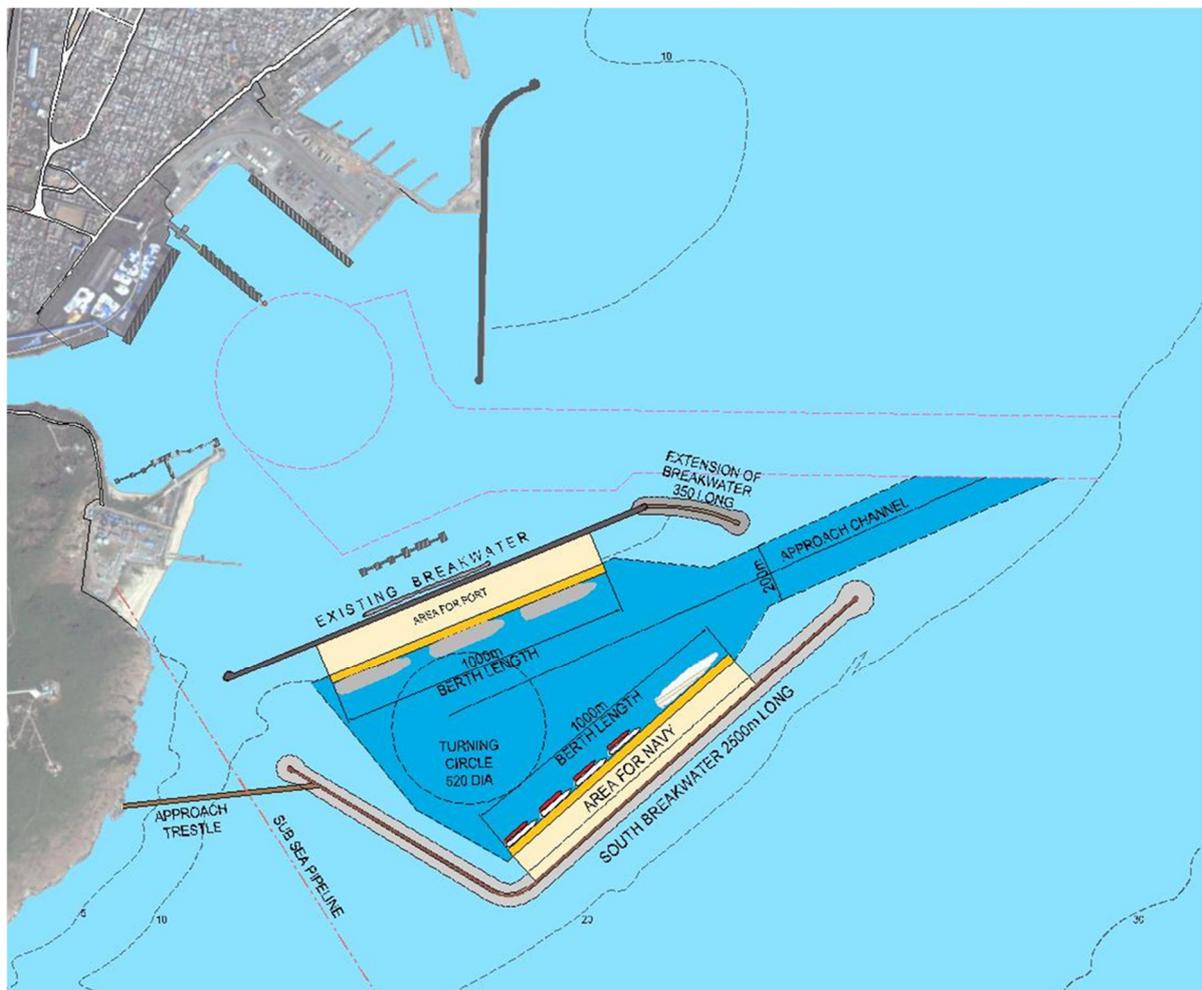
Proposed Outer Harbour - Layout Plan Alternative 2
